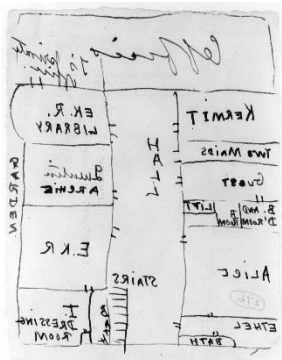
First Lady Edith Roosevelt's plan for the family rooms of the White House (1901).
